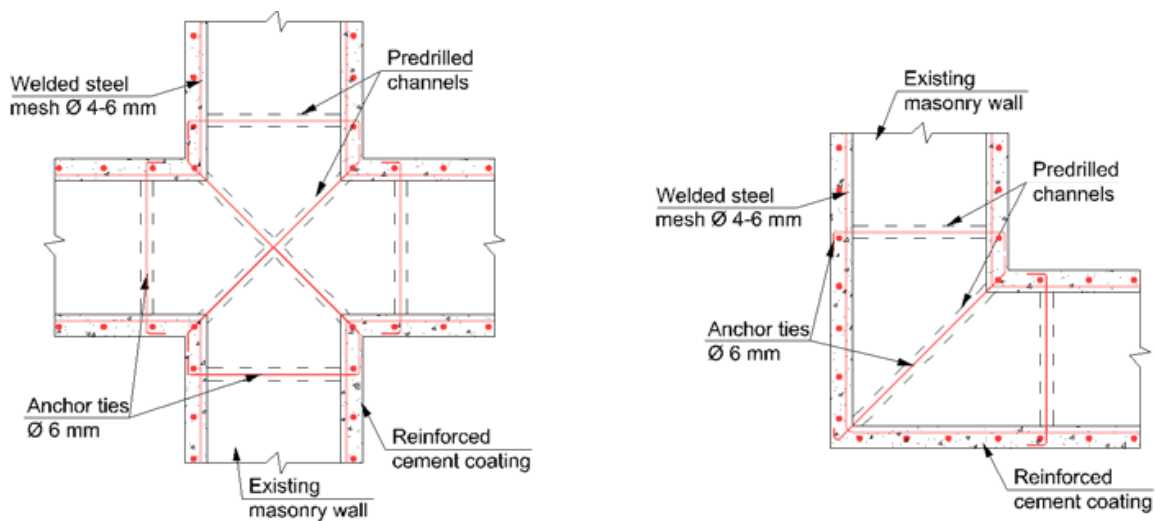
Details showing anchoring of RC jackets at corners and wall intersections[51]
